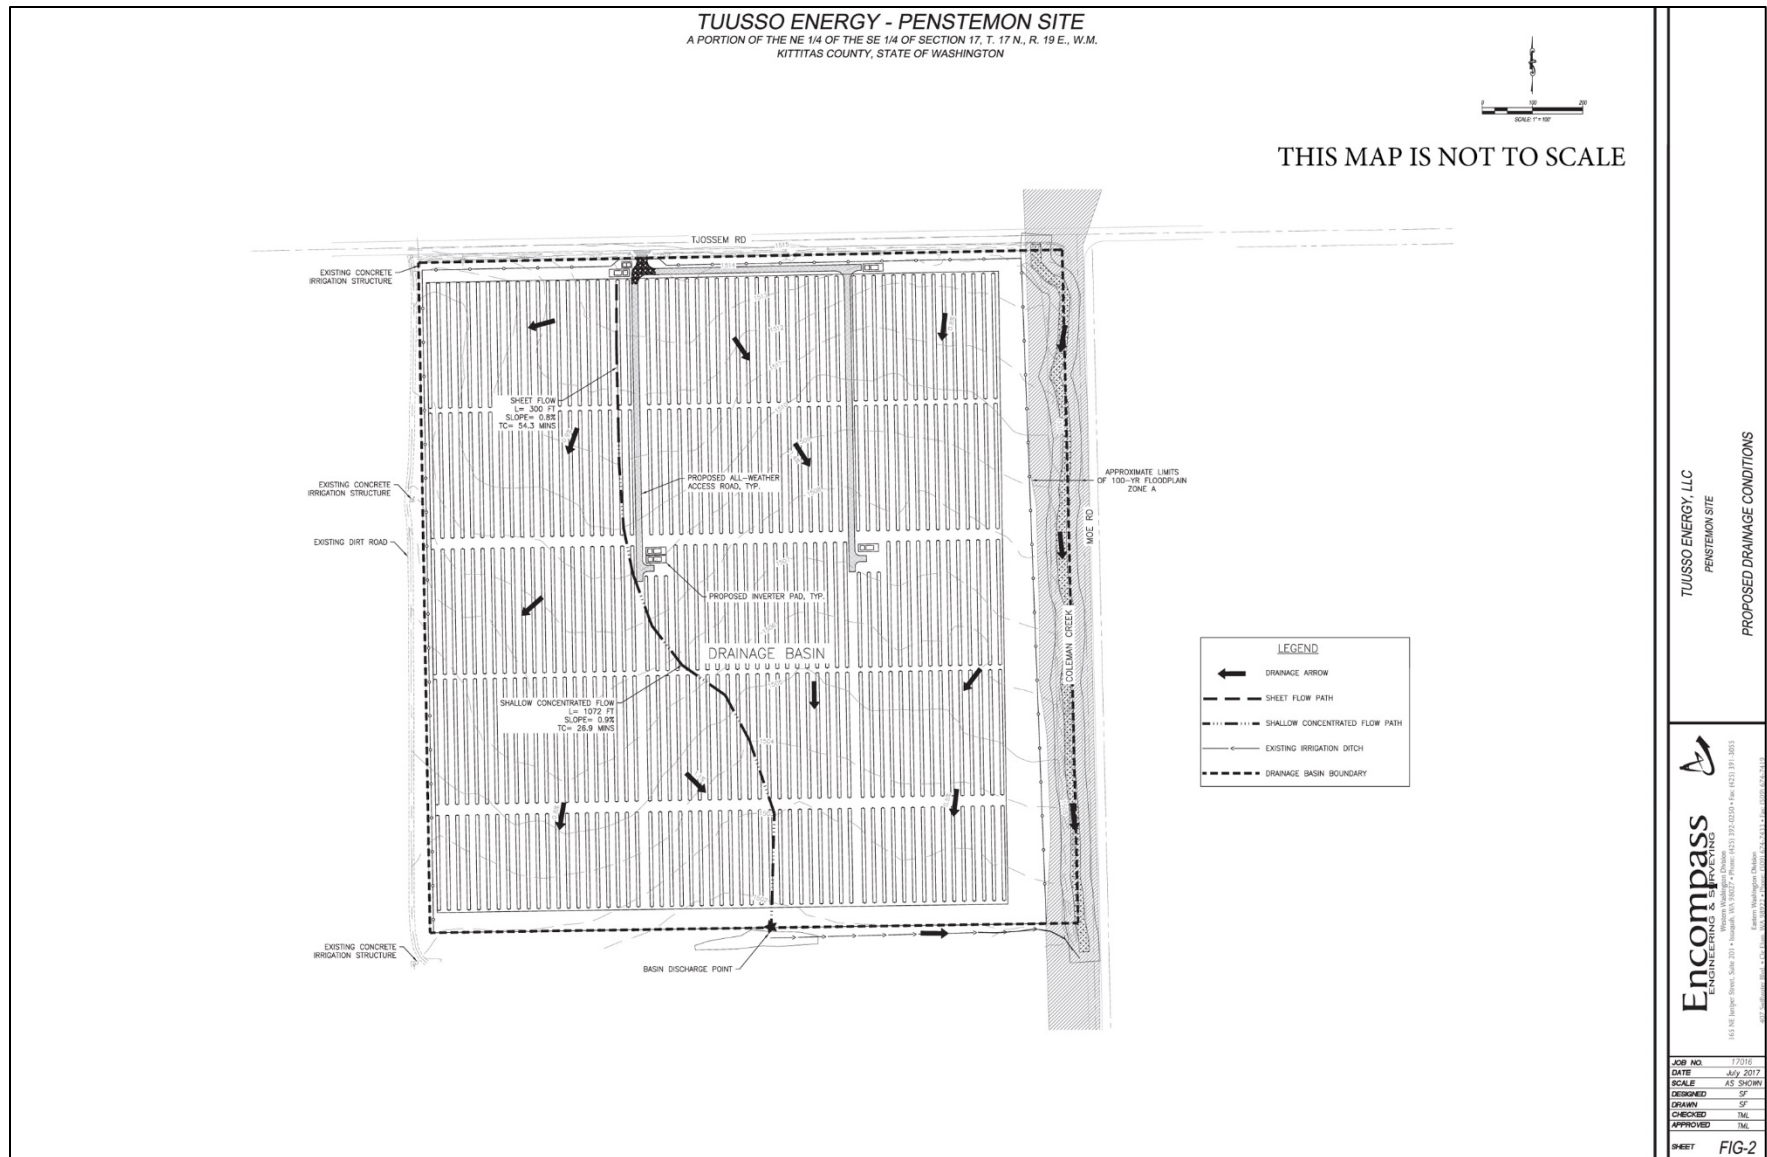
Proposed drainage conditions for the Penstemon Solar Project site.
